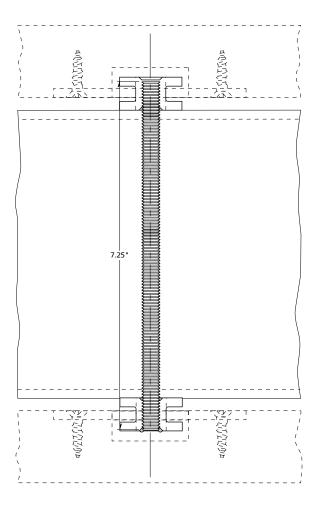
" x 6" RAIL PLUG SIDE ELEVATION B'-B
